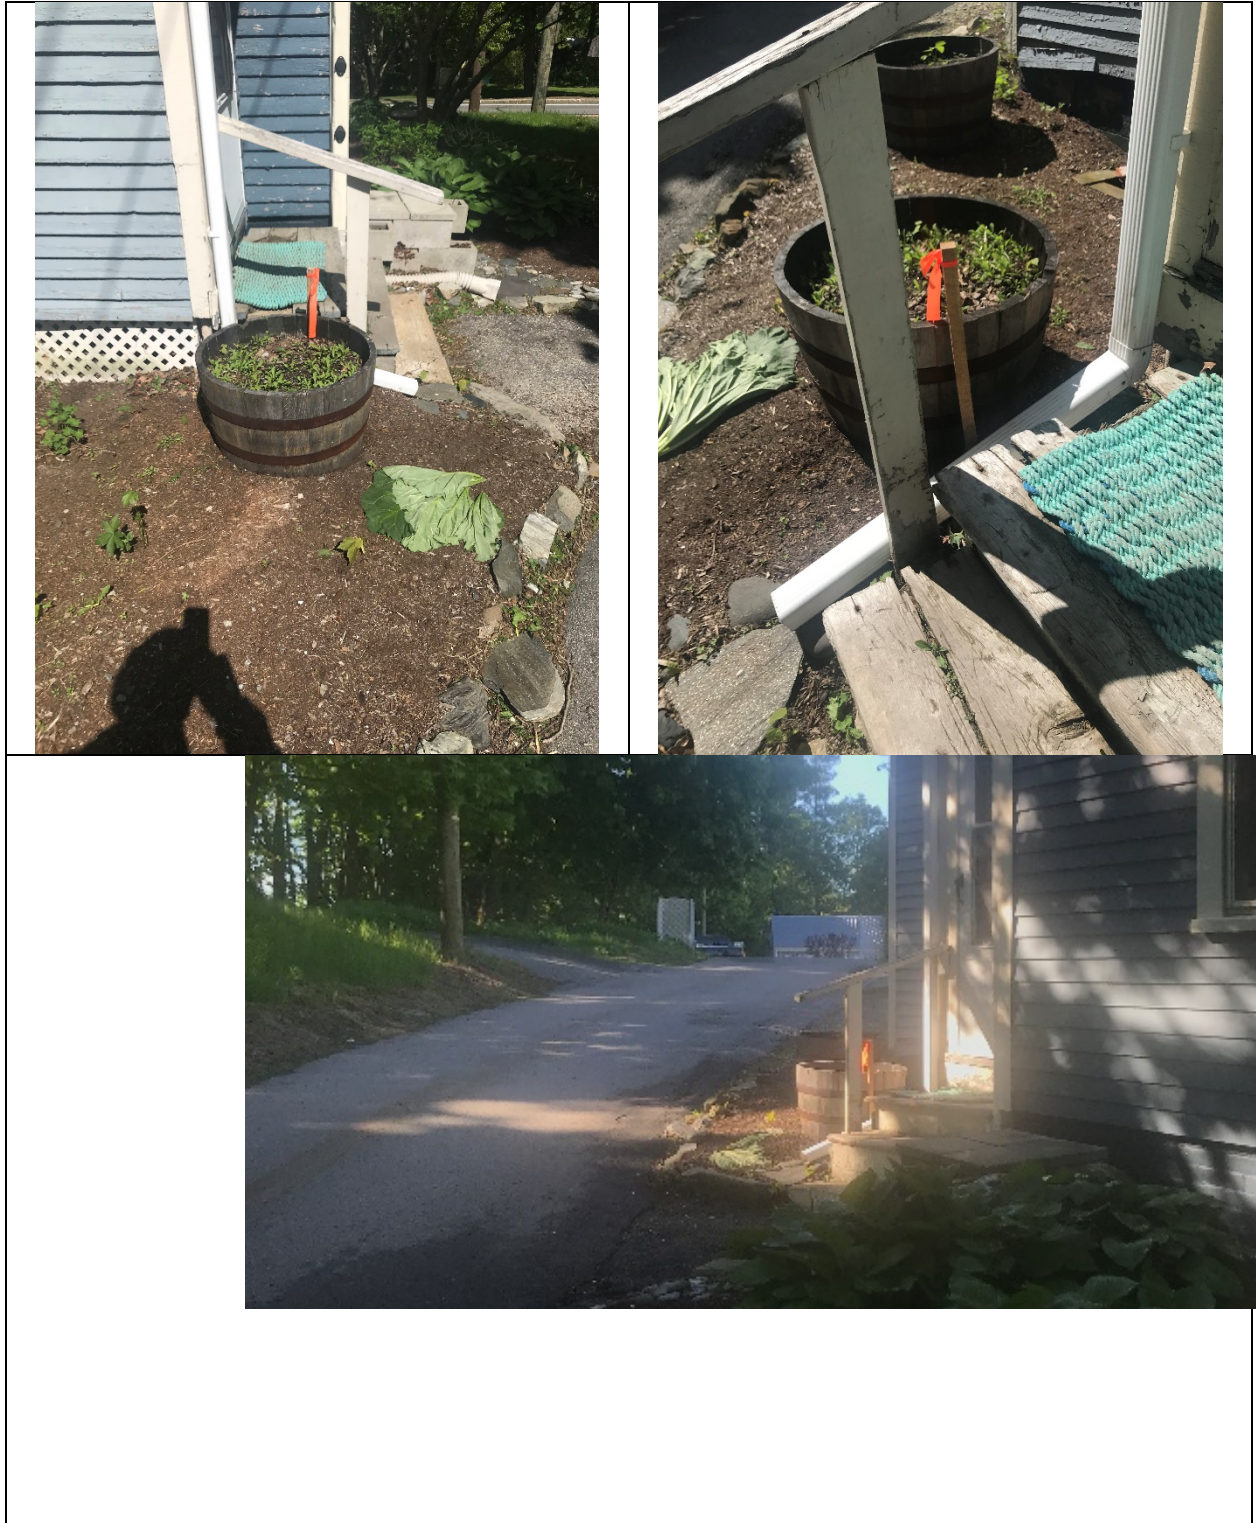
Location of boundary stake from various angles. The worn wooden planks of the steps conceal existing concrete steps that extend beyond the property line. These steps will be removed as part of this proposed change.
